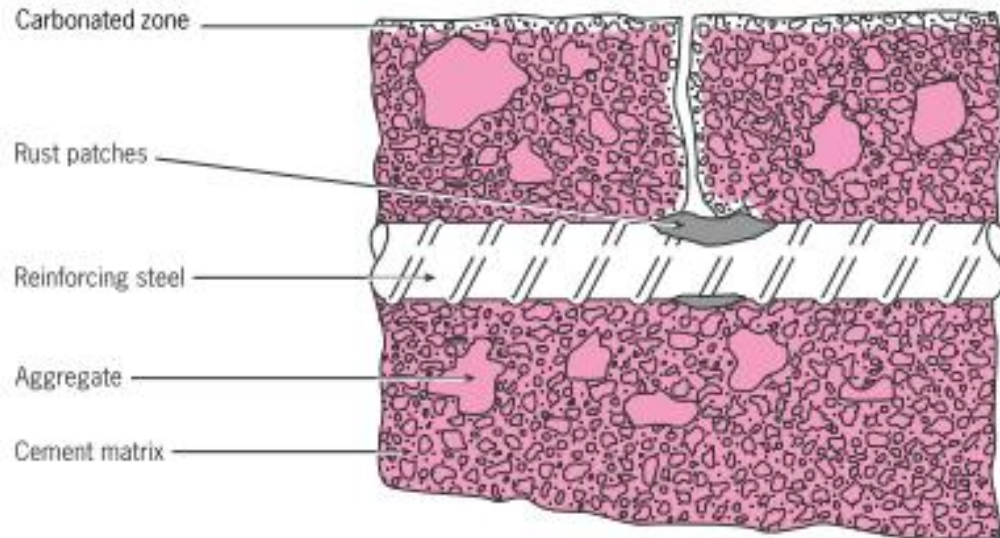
Diagrammatic view of steel corroding in cracked concrete (Digest 444 part1, 2000)
